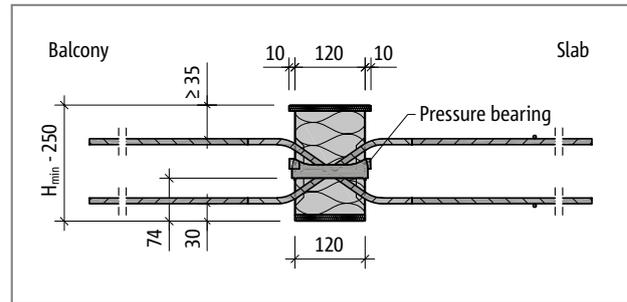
Schöck Isokorb® XT type Q-VV5 to Q-VV8: Product section
